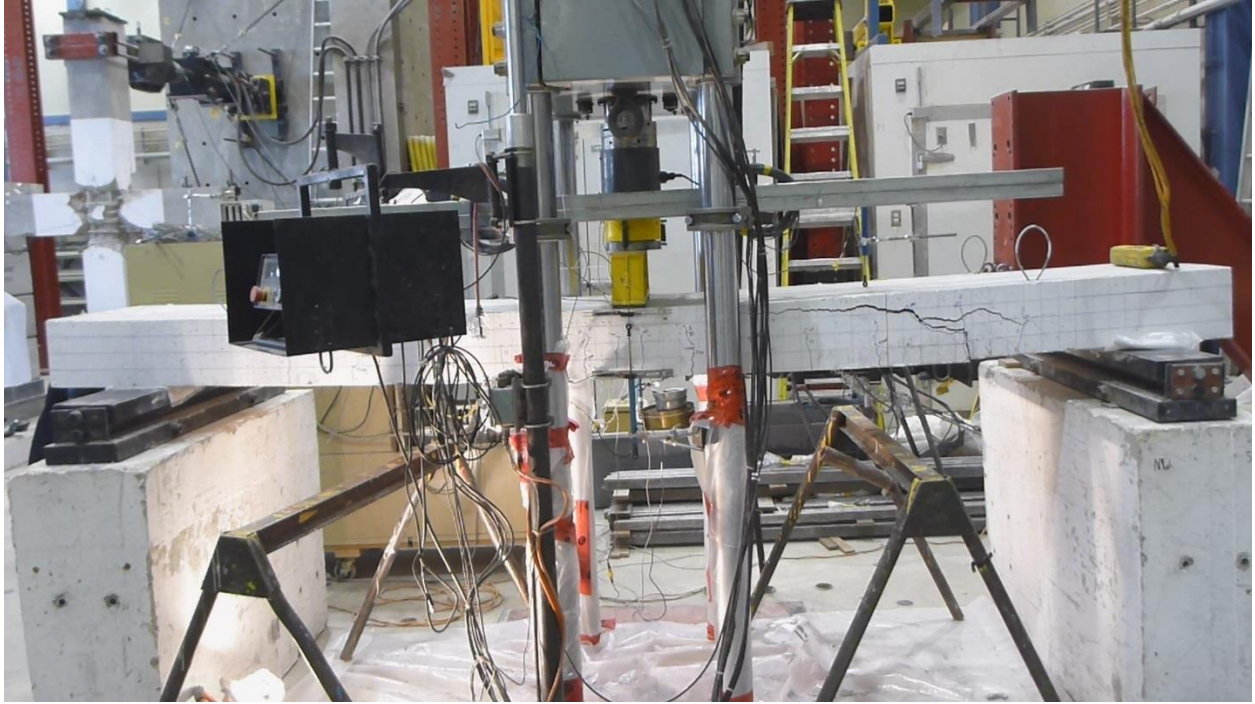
Modes of Failure and Condition of Slab LP-S-25 at Failure
